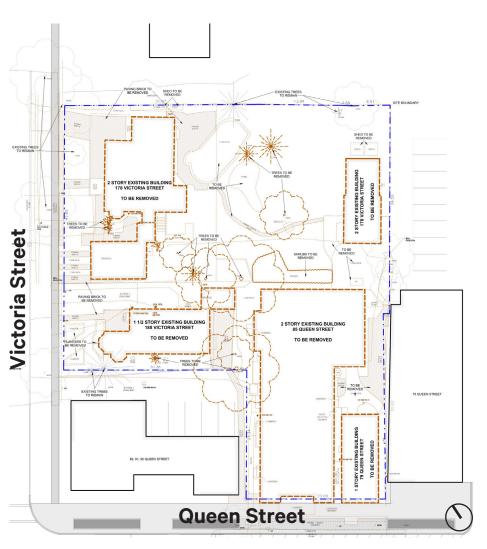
Site Plan - Existing Site Condition Source: Lett Architects Inc.
